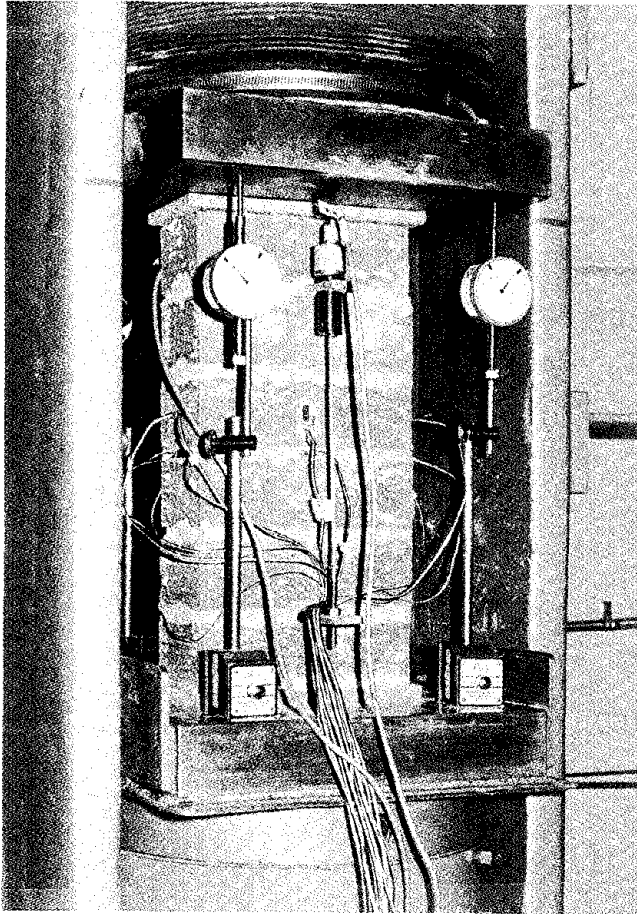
The plate shows a prism in the testing machine. The centre mortar joint and the unit above this joint are strain-gauged. The LVDT measured displacement over four bricks and joints. The dial gauges were used to determine the machine cross-head movement.
